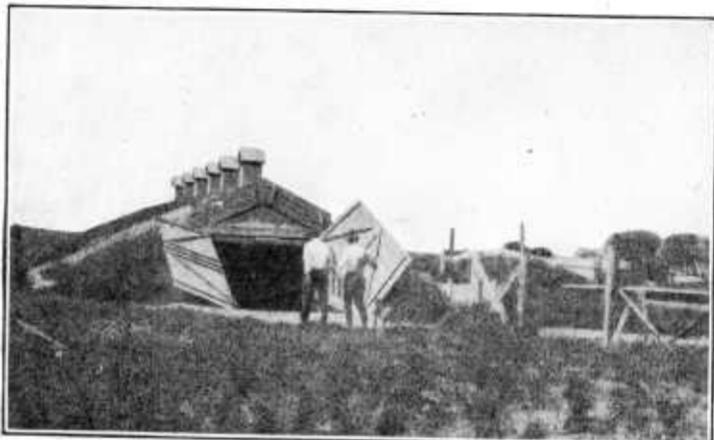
A potato storage cellar, showing a bulkhead driveway entrance in which the grade into the cellar is cared for after entering the bulkhead. Jerome, Idaho.
